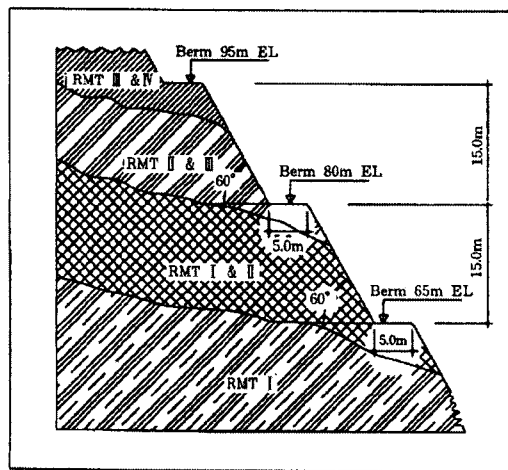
Typical geometry of the planned rock slopes(Jee, 1997)
